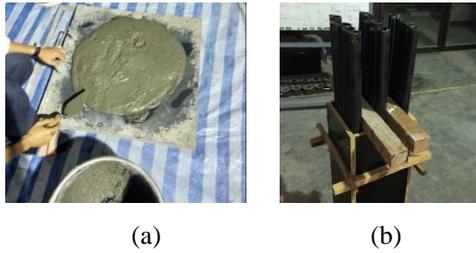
Filling of High-Performance Concrete into Prefabricated Steel Tubes.
